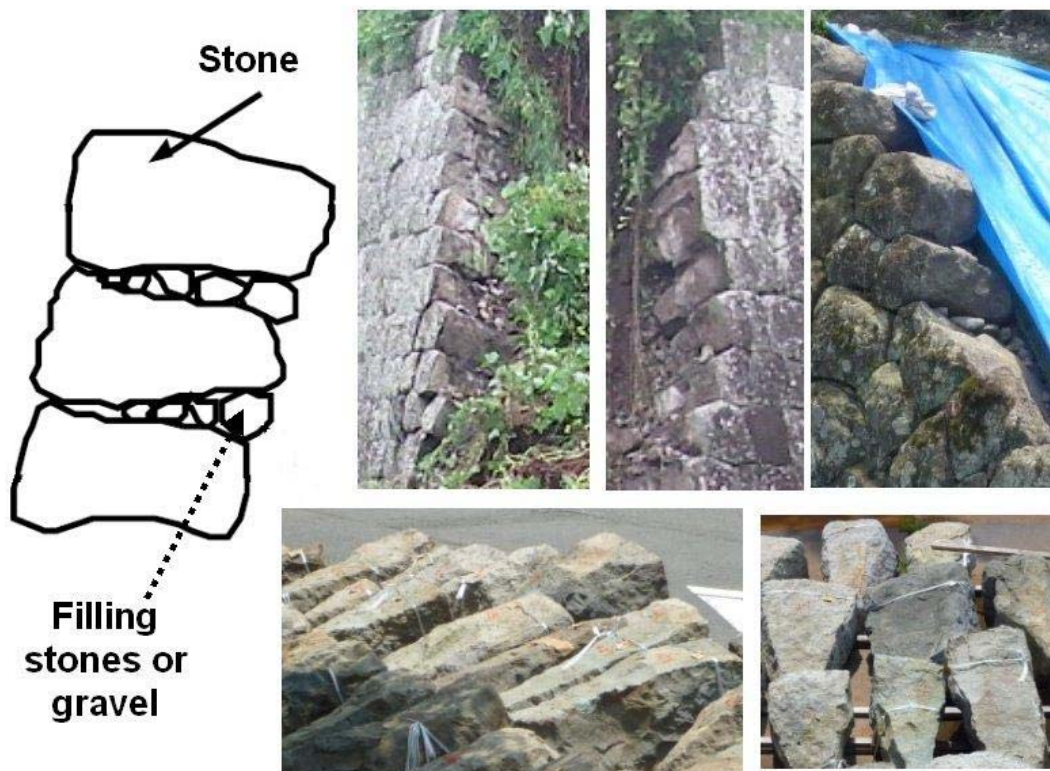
Masonry technique for building retaining and castle walls of Japan and views of stones used in Sunpu castle retaining walls.
